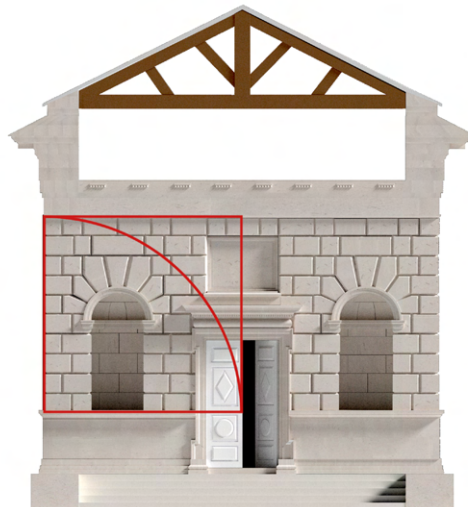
Printing House, Trinity College Dublin, inner wall of portico.
